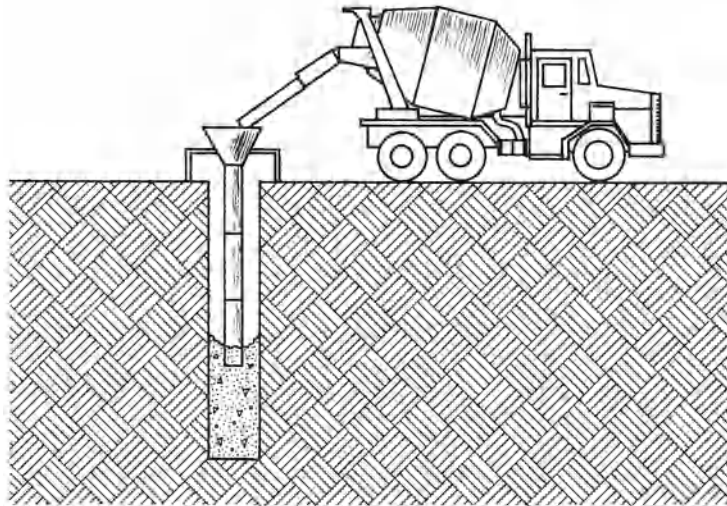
The use of a tremie for depositing concrete under water.
